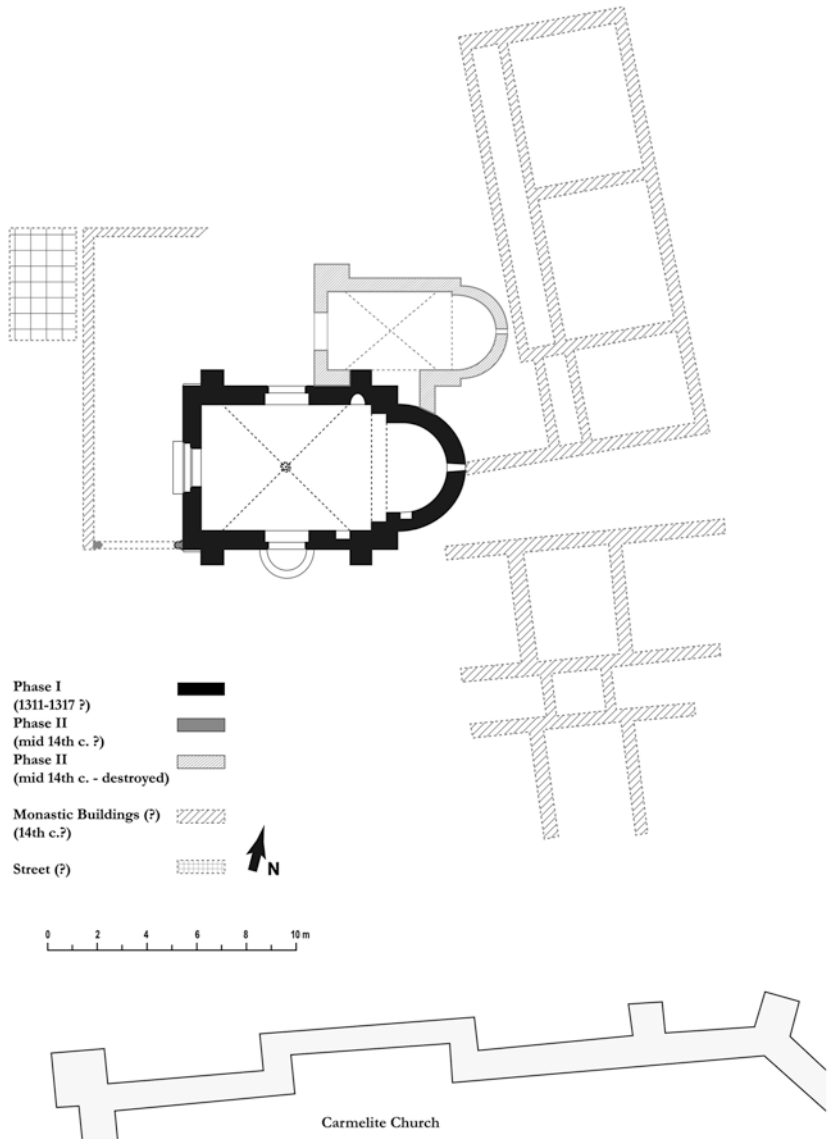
Famagusta, Armenian Church and convent, site plan
